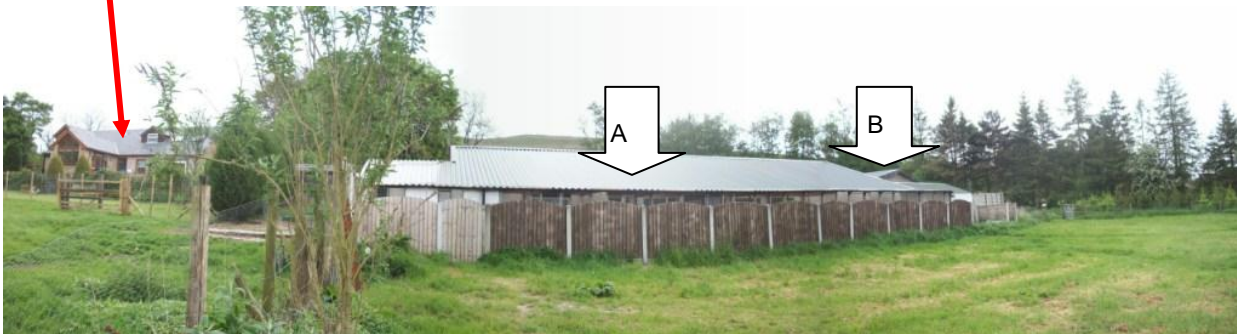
Rear view of kennels (A) and cattery (B) at SW elevation; the view also shows 'The Eaves' (house) on far left.
